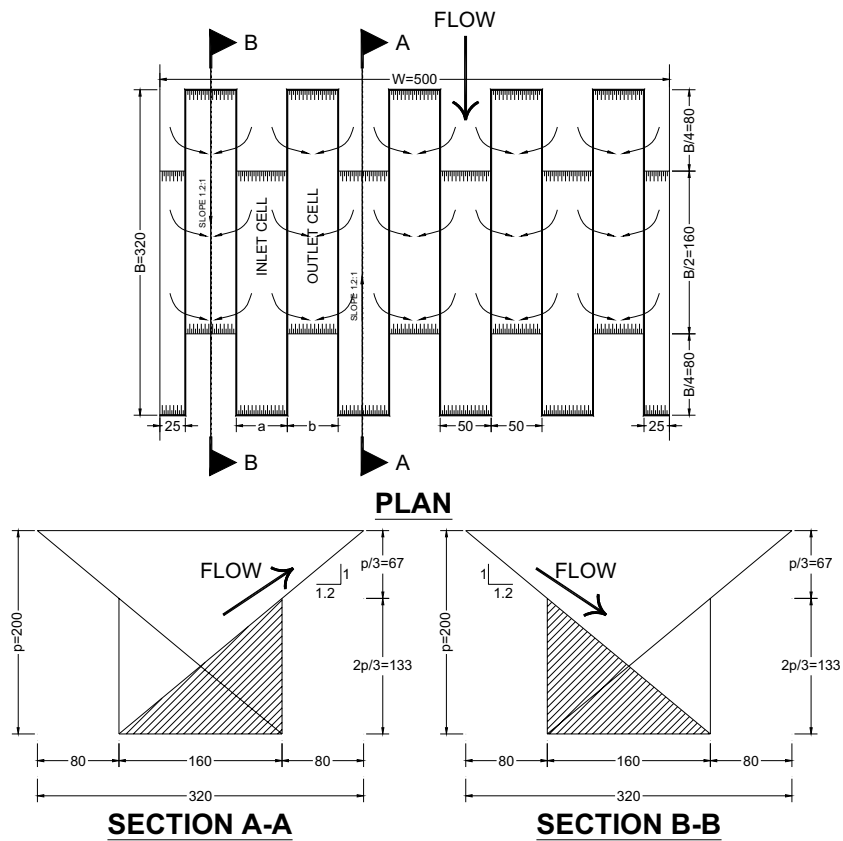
Plan and section of model P_2M_3 (both sides ramping), (dimensions in mm)
